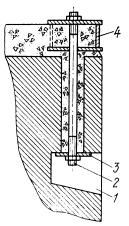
Recess in the foundation to receive and chor bolt plate
